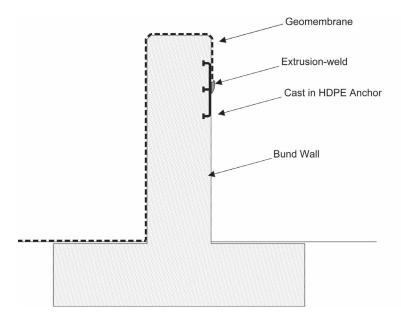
Typical arrangements for anchoring liner to concrete bund wall
